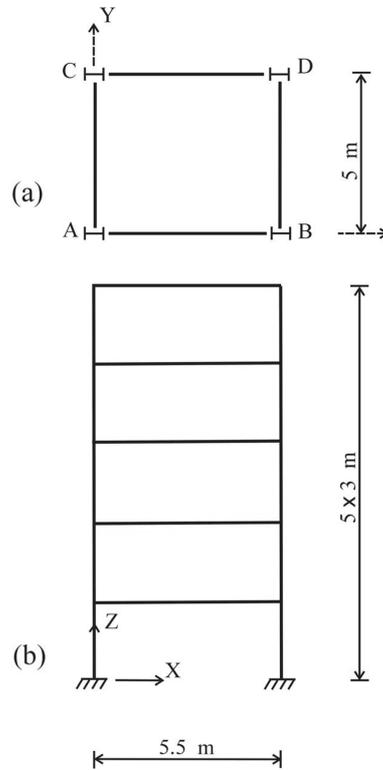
Five-storey 40-member space frame: (a) plan, (b) side view
